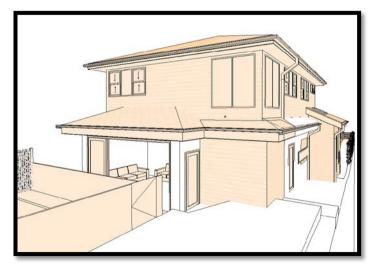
Proposed works at the rear of the site. (Action Plans 2020.)
